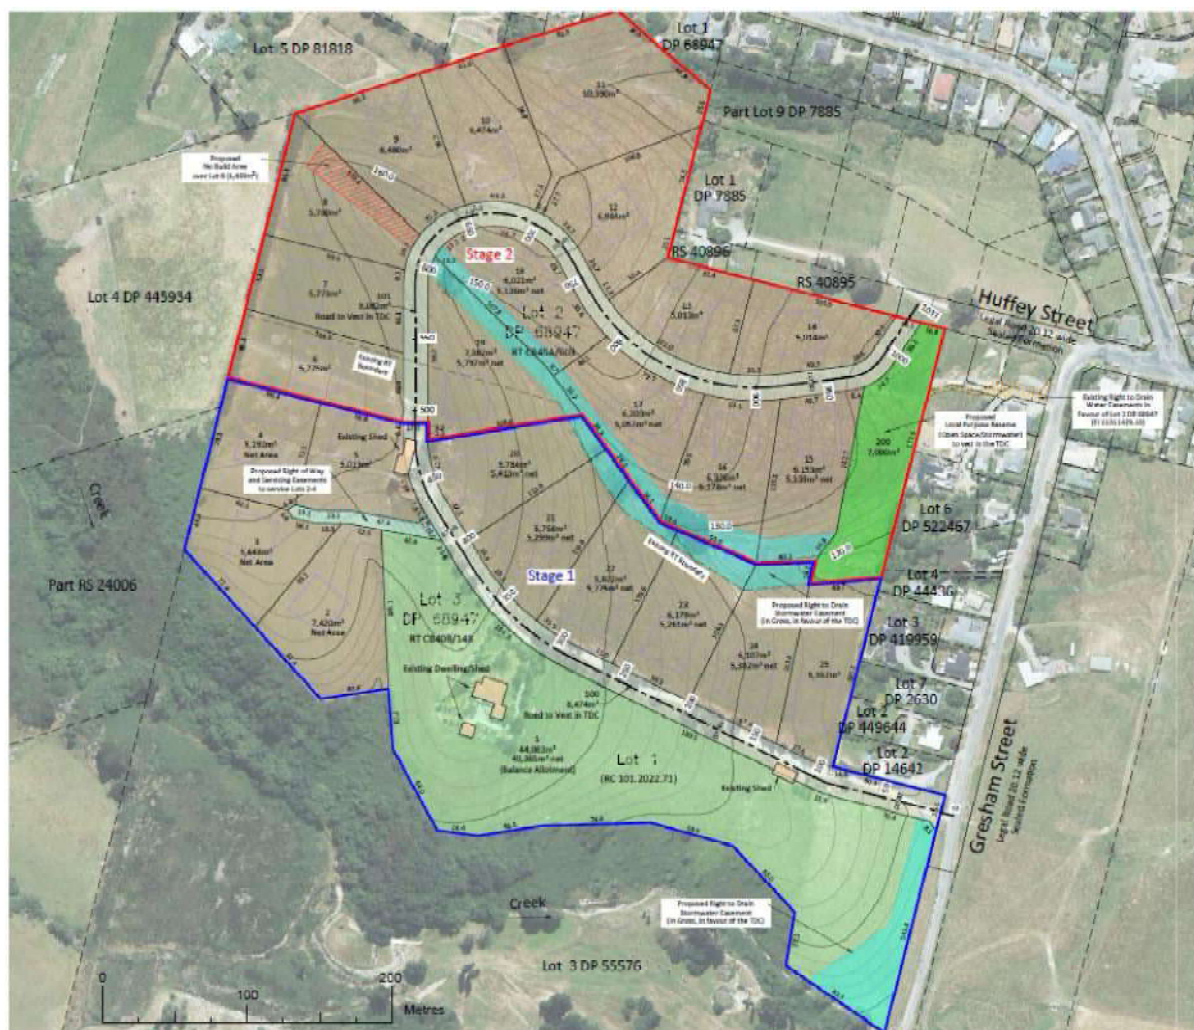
Proposed subdivision layout. Source Davis Ogilvie
